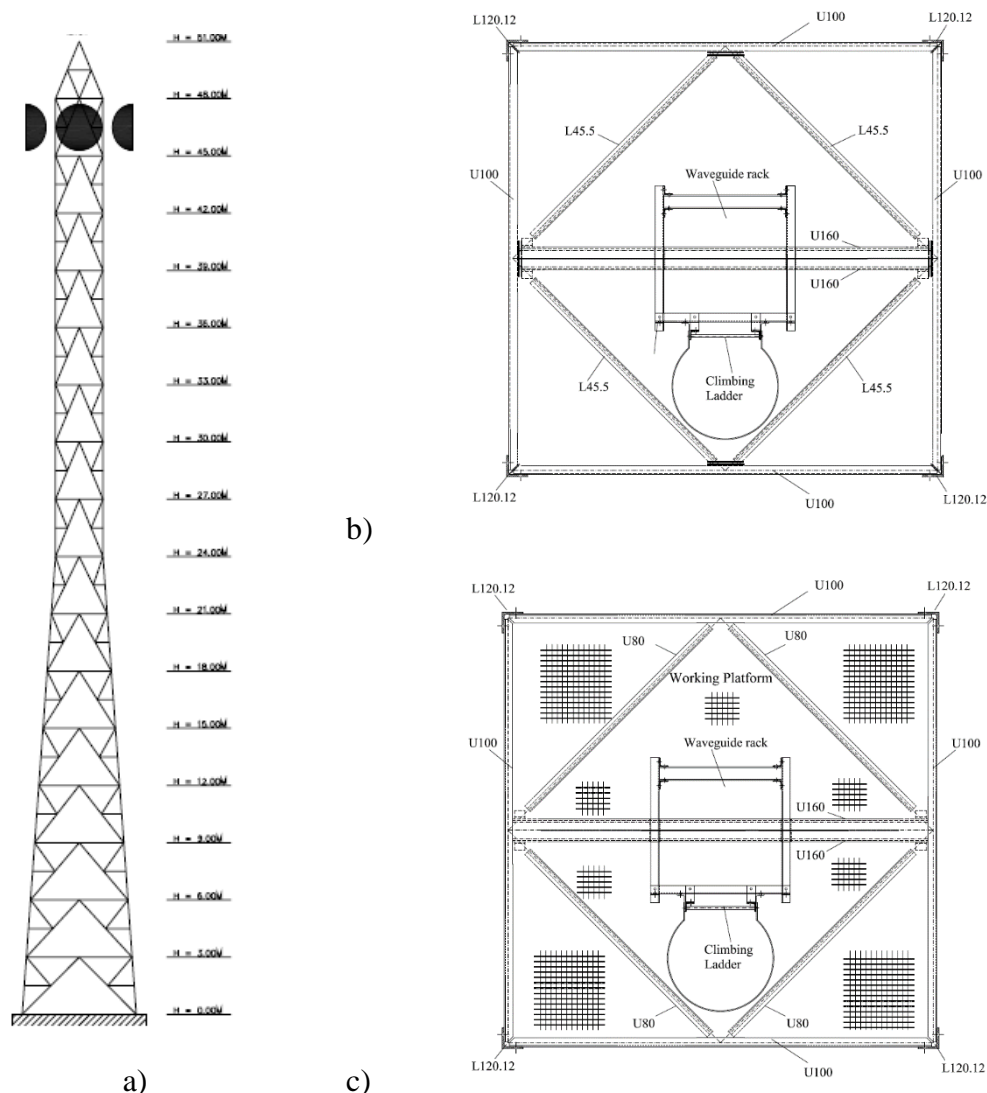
a) Side view of the tower. b) Typical plan of a horizontal diaphragm. c) Typical plan of a working platform [1].
